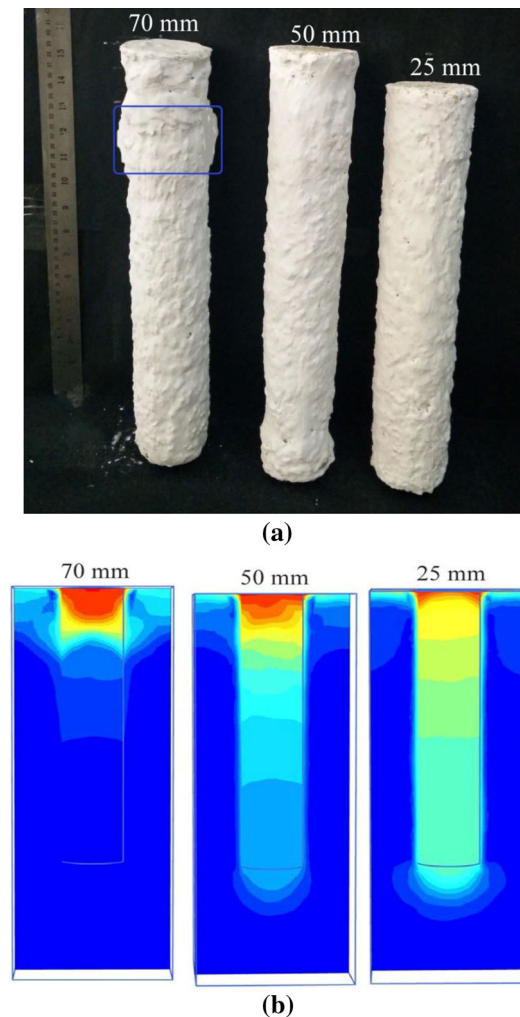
Deformed shapes of horizontal striped granular piles; a laboratory model tests, b FEM
